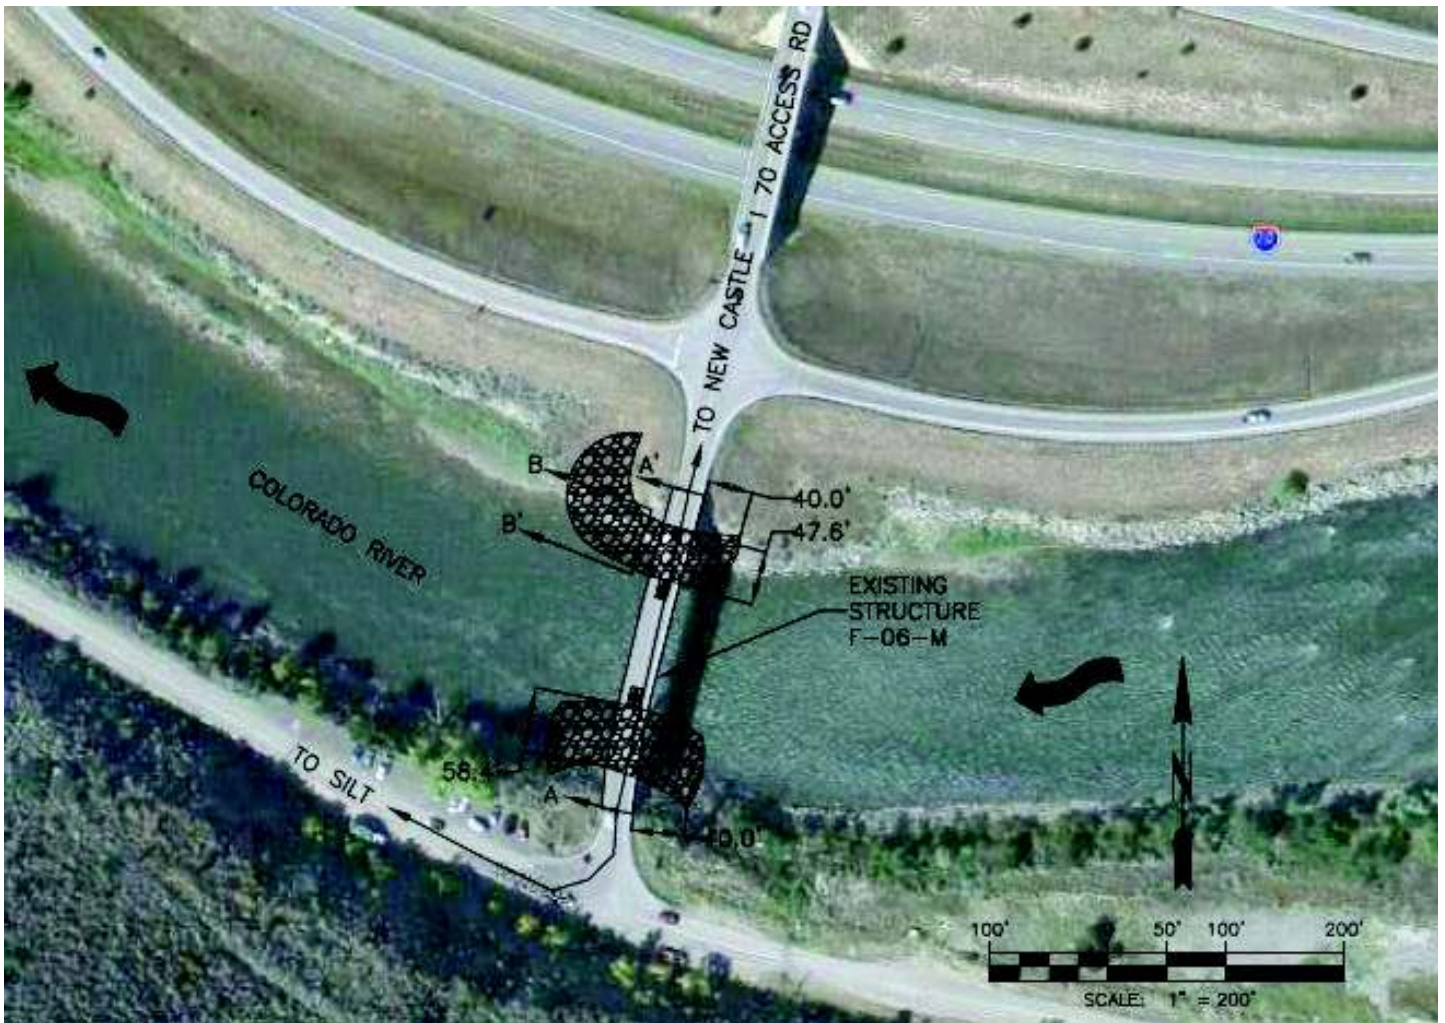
Plan view of Bridge F-06-M with recommended hydraulic scour countermeasure locations
